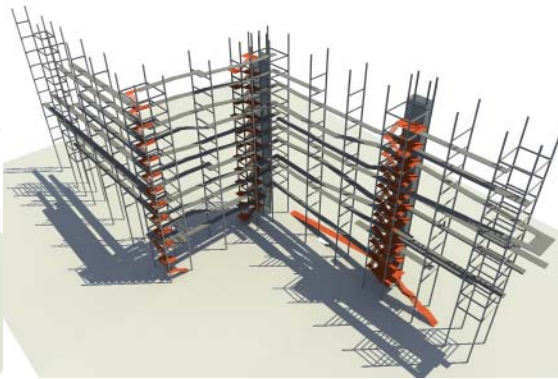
Secondary bracing in terms of girders and joists (Author, 2010).
